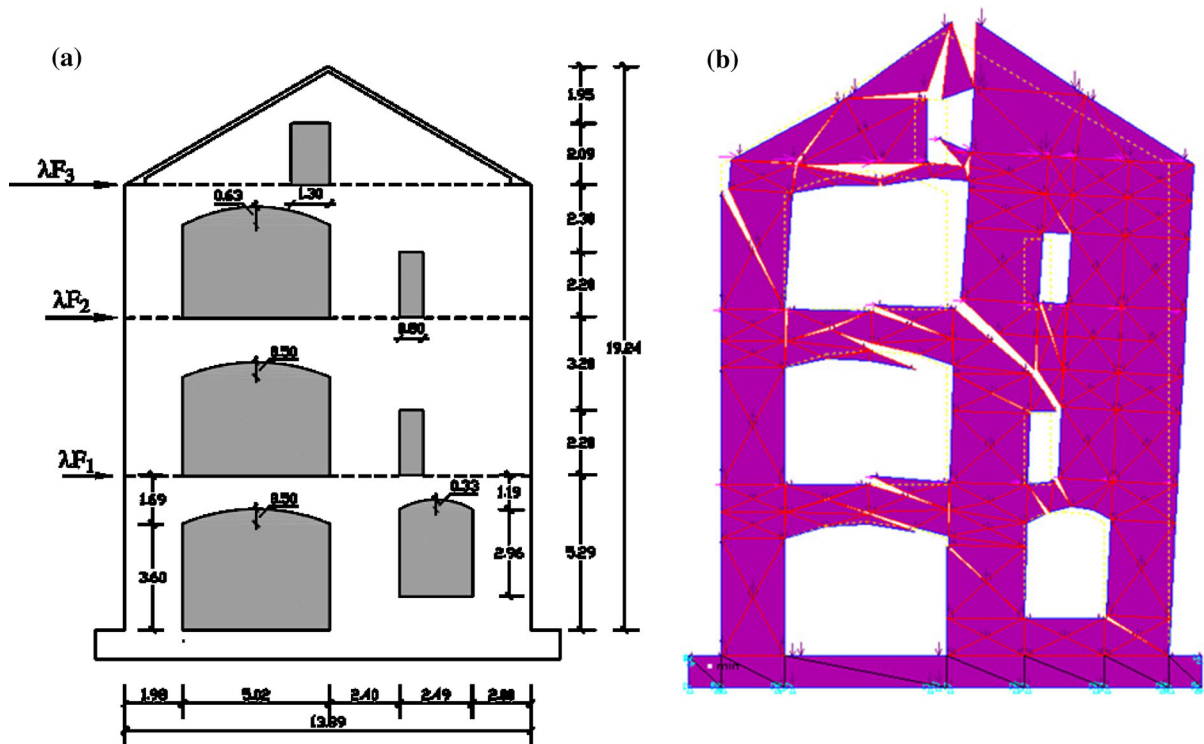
Masonry wall with openings subjected to fixed vertical loads and variable horizontal forces: a geometry and loading scheme; b predicted collapse mechanism
